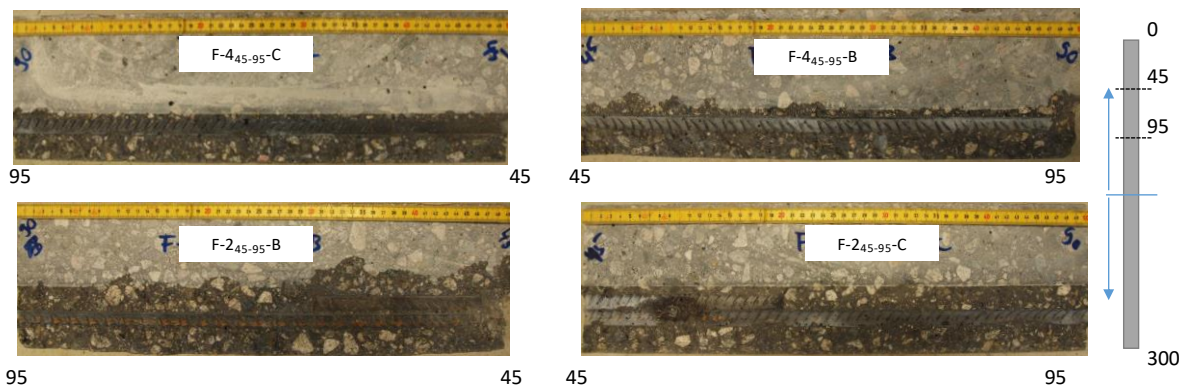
Steel-concrete interface of beam F section 40 to 95 cm White precipitate at the cracks and spread over the steel-concrete interface. Superficial rust
